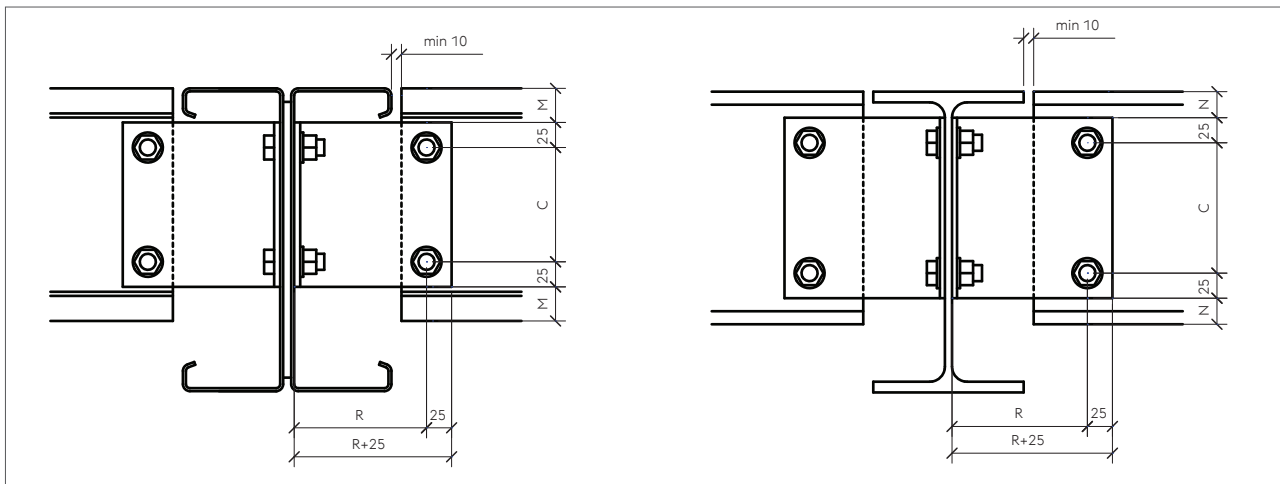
Detail of the connection of two M-type secondary beams to a girder made of C+ sections or an IPE section
